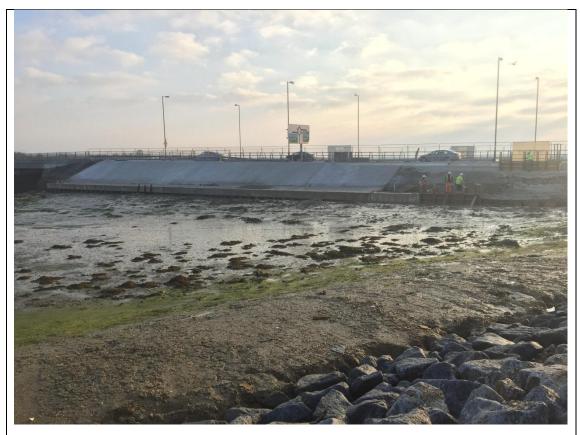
Typical Eastern Road Bridge Embankment encasement works
